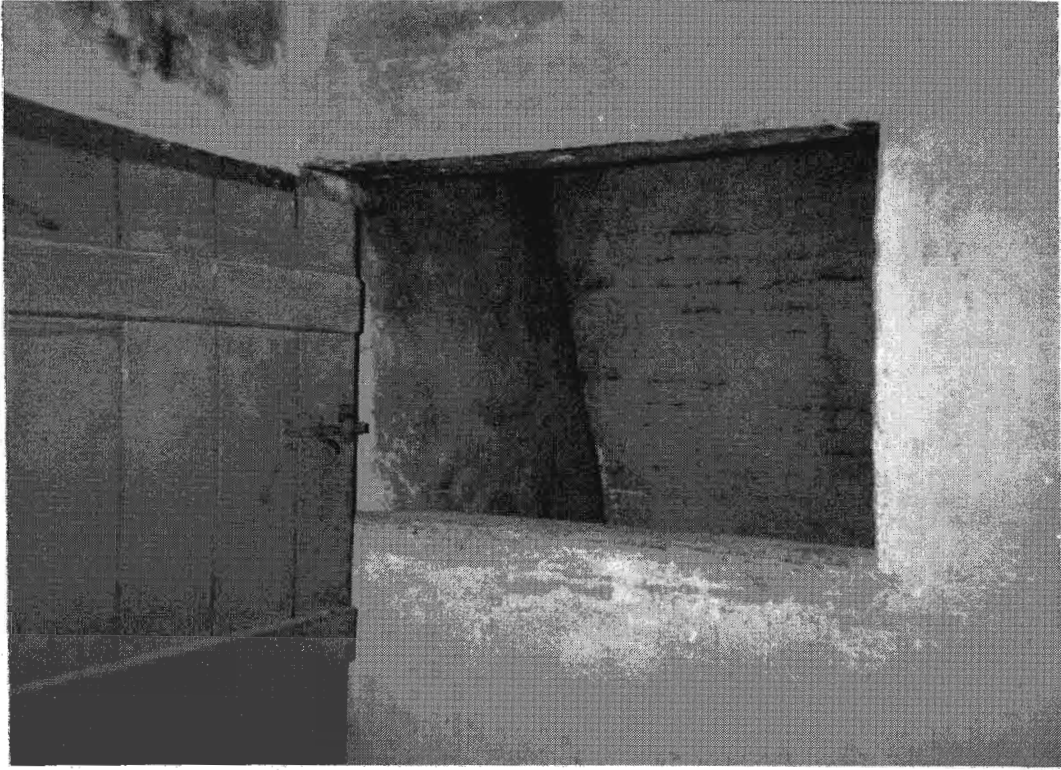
Detail of the 'void' area adjacent to the chimney flue, viewed from F 7. The 'void' area is to be made into an 'en suite' facility.
